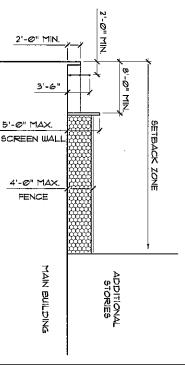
Fences and screen walls are permitted in the setback zone provided no portion of the fence or screen wall is within 8 feet of a street facade.
